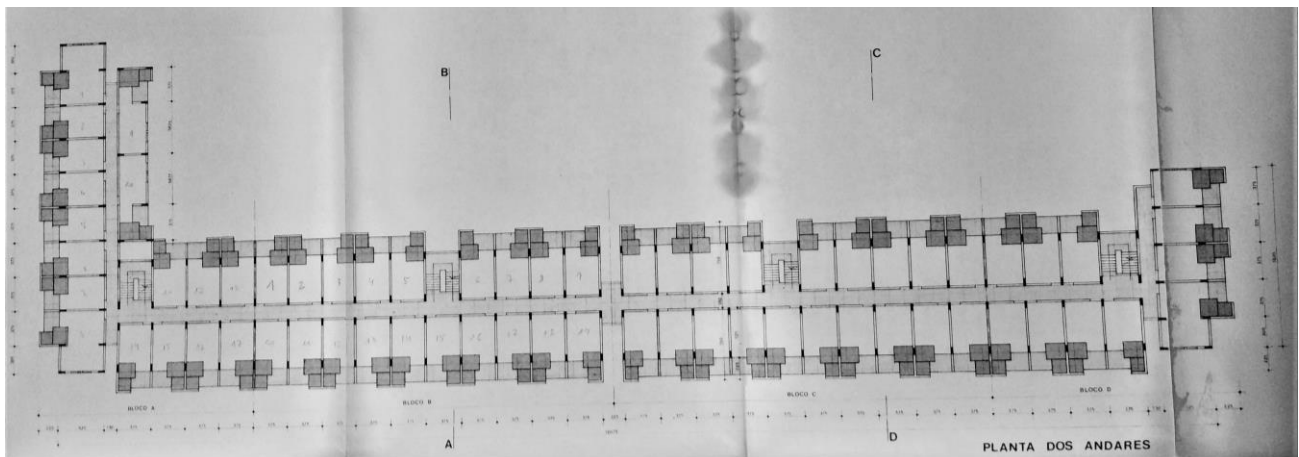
"STDM - Resettlement Housing Block" Floor Plan. Source: (CD-FAUP, 1978).
